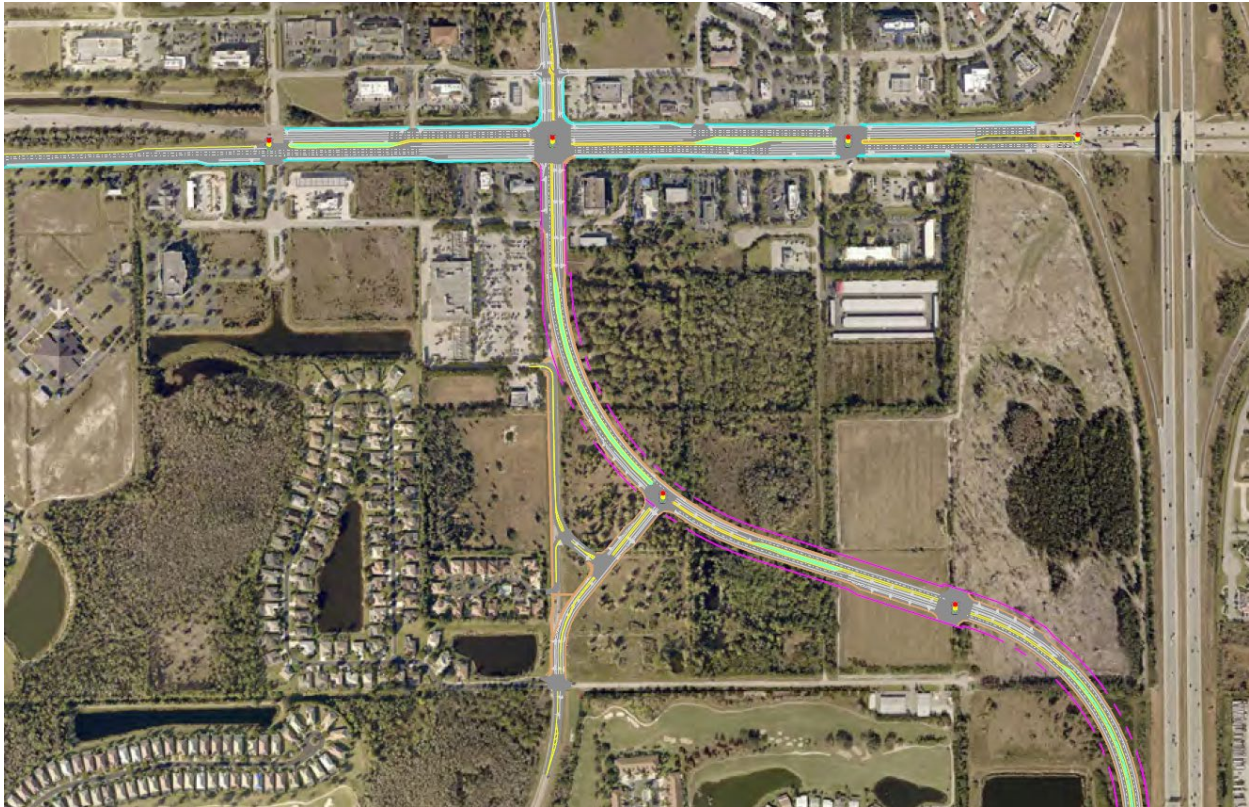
Proposed Extension of Three Oaks Parkway and Widening of Daniels Parkway
